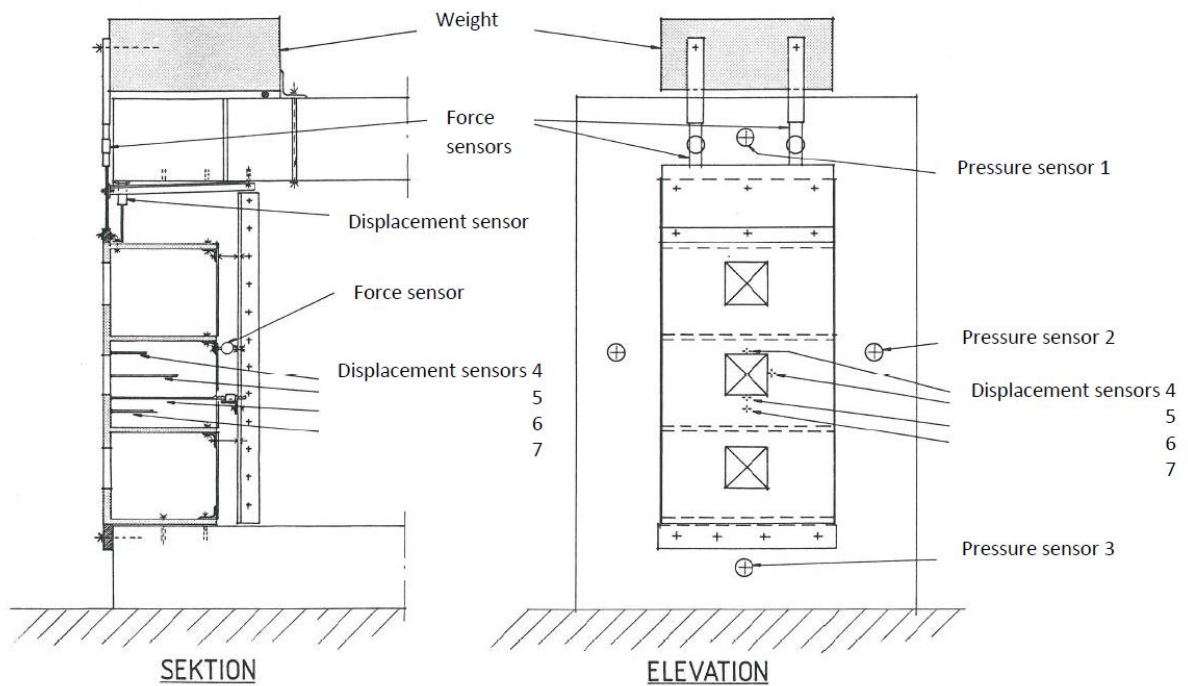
Experimental setup. Four displacement sensors are set around the second window. Force sensors are set on the third floor slab and on top of the façade wall. Three pressure sensors are set in the rig above, beneath and on the side of the façade wall.
